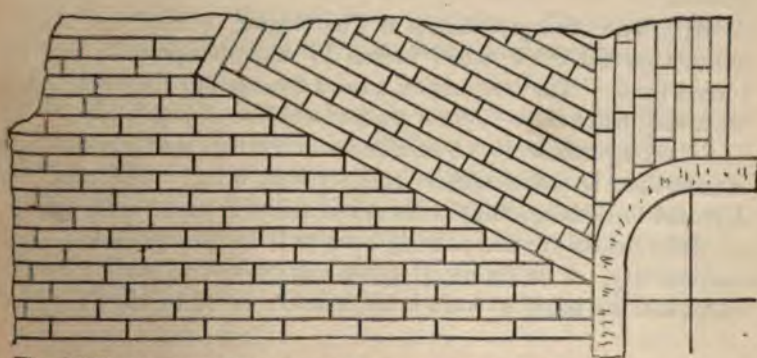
PLAN SHOWING ARRANGEMENT OF JUNCTION.
